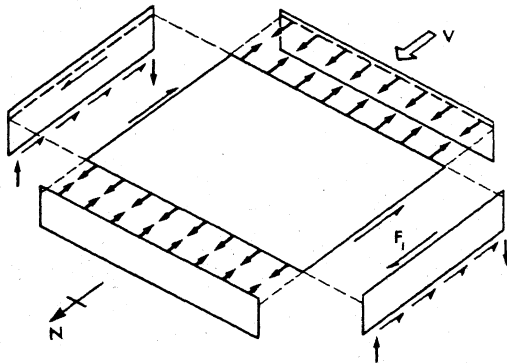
Seismic Forces in connections between Roof, Walls and Foundations.
